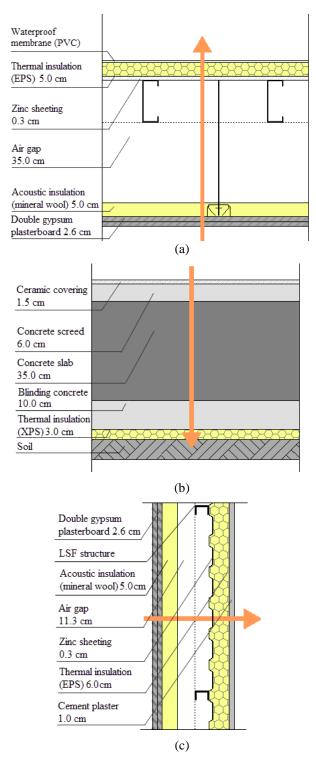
Envelope construction solutions of the original model: (a) Flat roof (b) Ground floor slab (c) Facade walls
